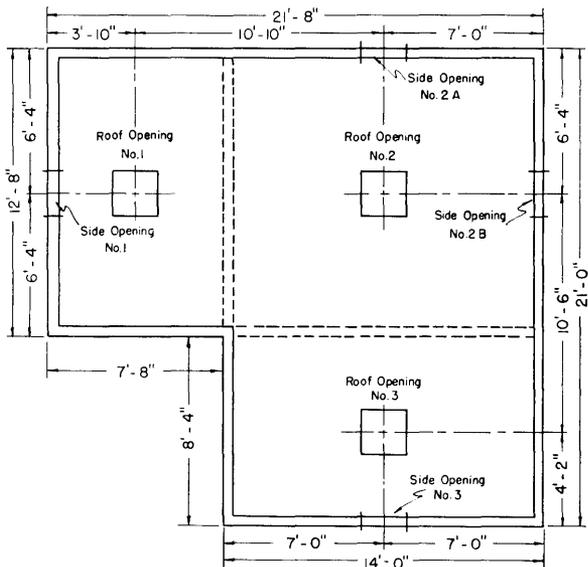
LOCATION OF SIDEWALL AND ROOF OPENINGS FOR FLAT ROOF CONSTRUCTION USED IN TEST SERIES 40-1 TO 40-8, INCLUSIVE.
